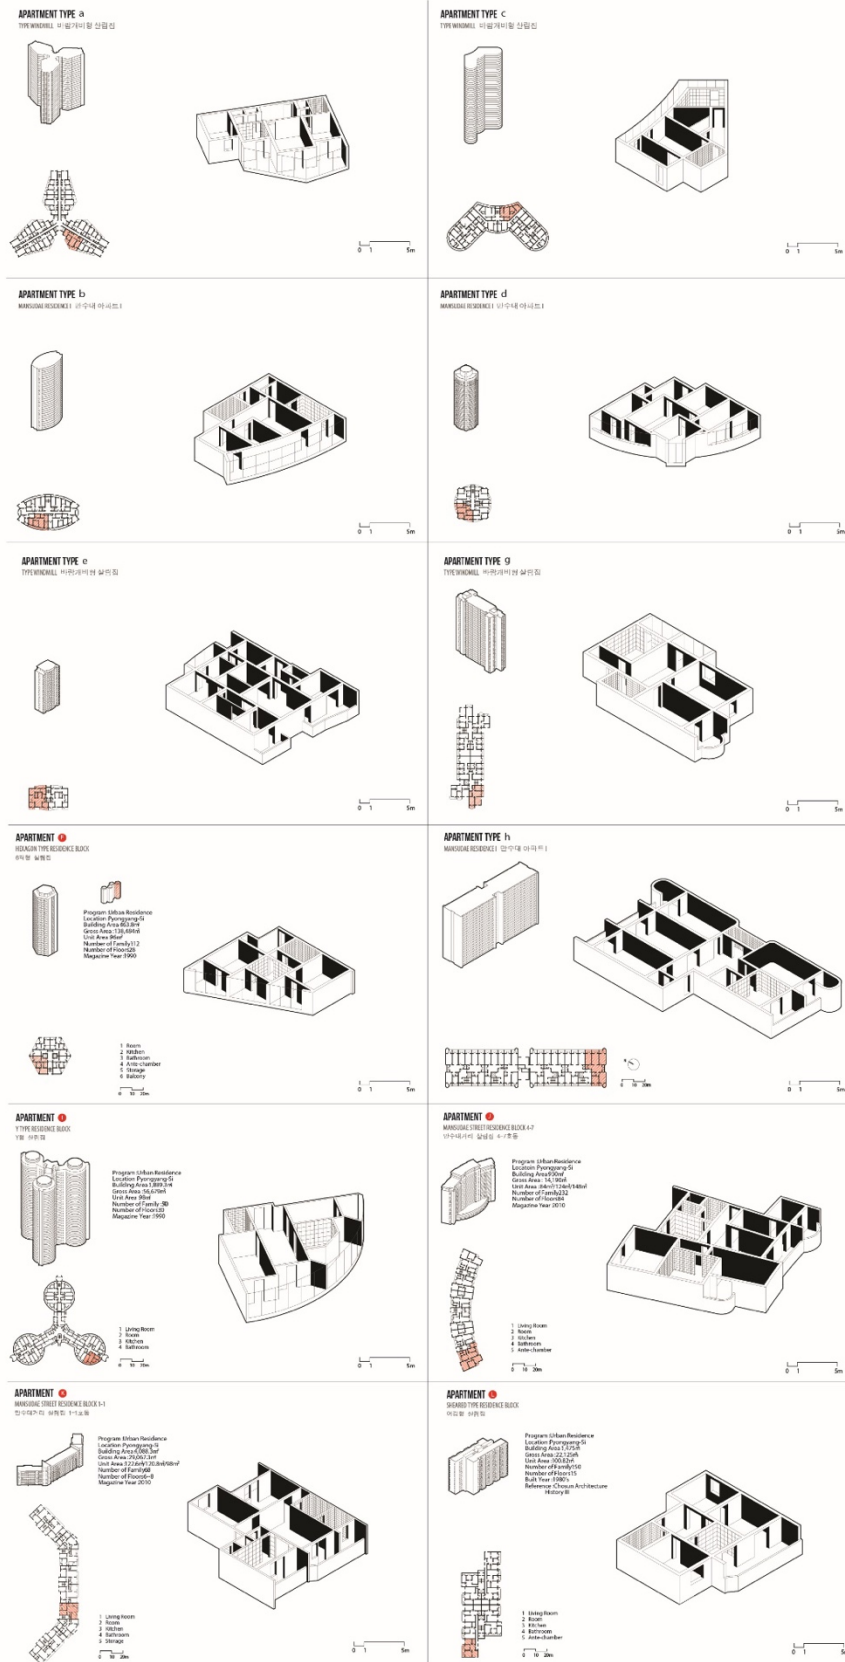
Residential development in Pyongyang, building types and unit plans, drawn by author
